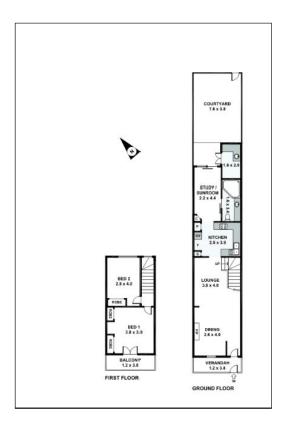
Layout of No. 53 Lackey Street (source: Domain)
